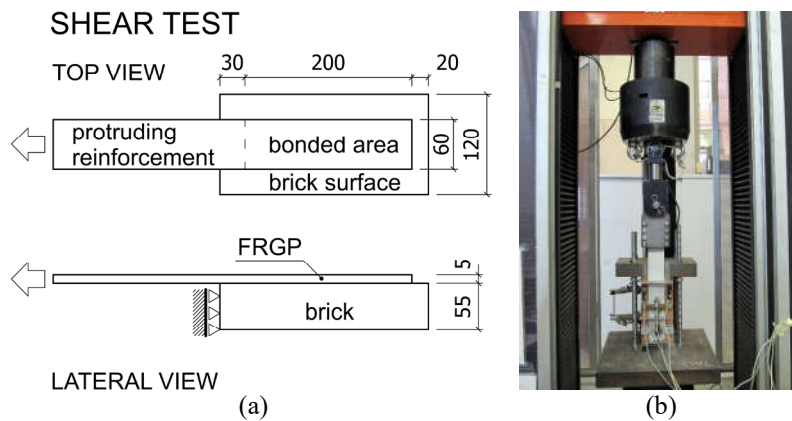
Sketch of a shear test specimen with dimensions in mm (a) and sample ready for testing (b)
